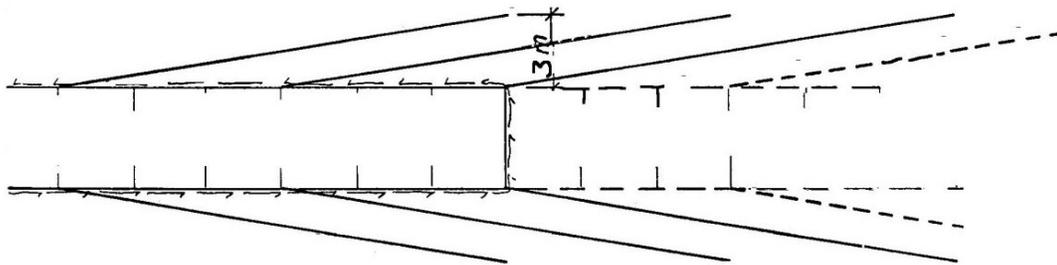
Drillholes for Pregrouting. Drill and Blast Tunnels.
